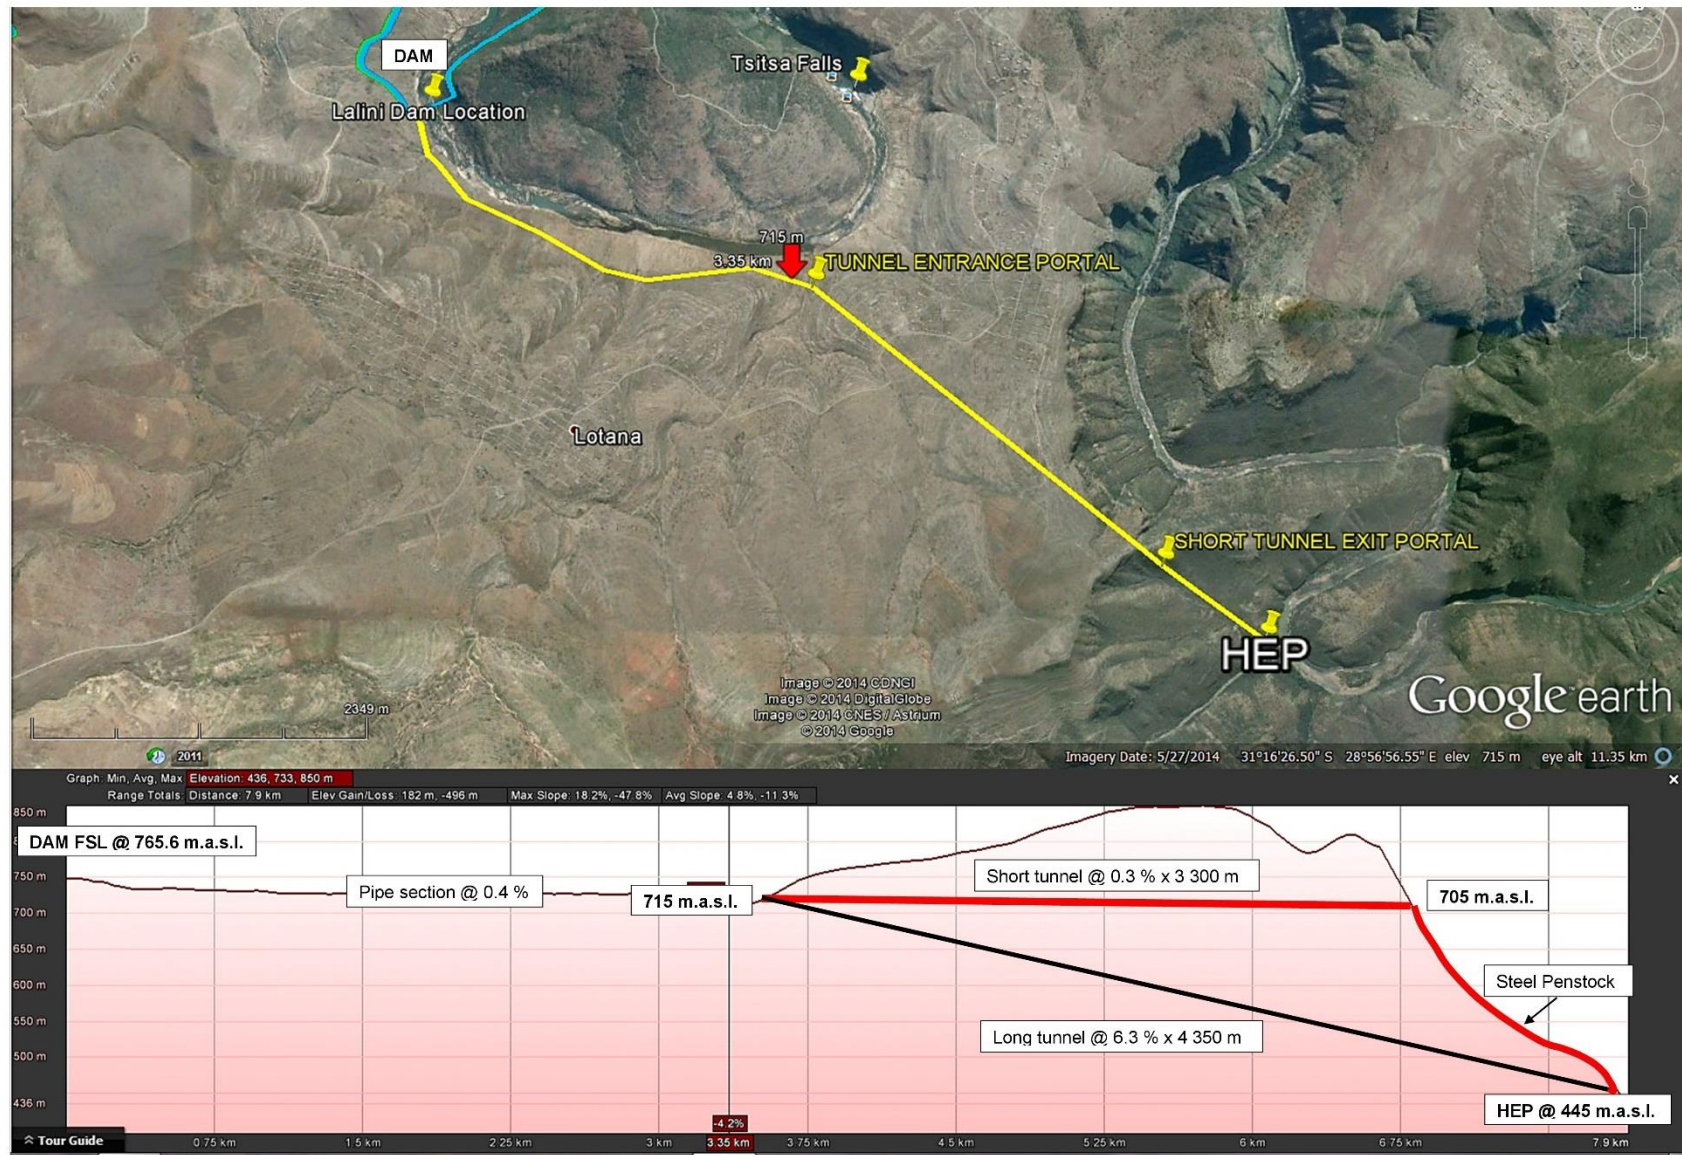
Tunnel Horizontal and Vertical Alignment Options
